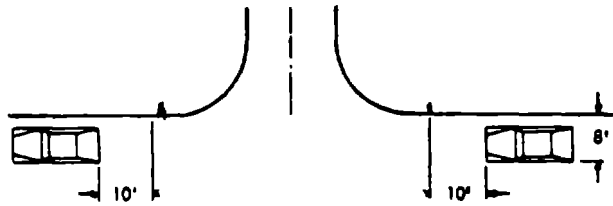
RECOMMENDED MINIMUM PARKING RESTRICTION ADJACENT TO DRIVEWAY OPENINGS
